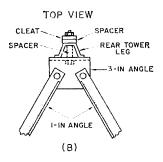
Sketch showing how the two pairs of cross braces are mounted.
